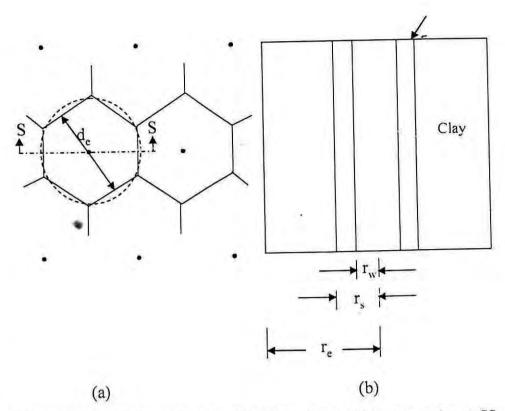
General layout of Sand Drains. (a) Plan. (b) Cross section at SS
